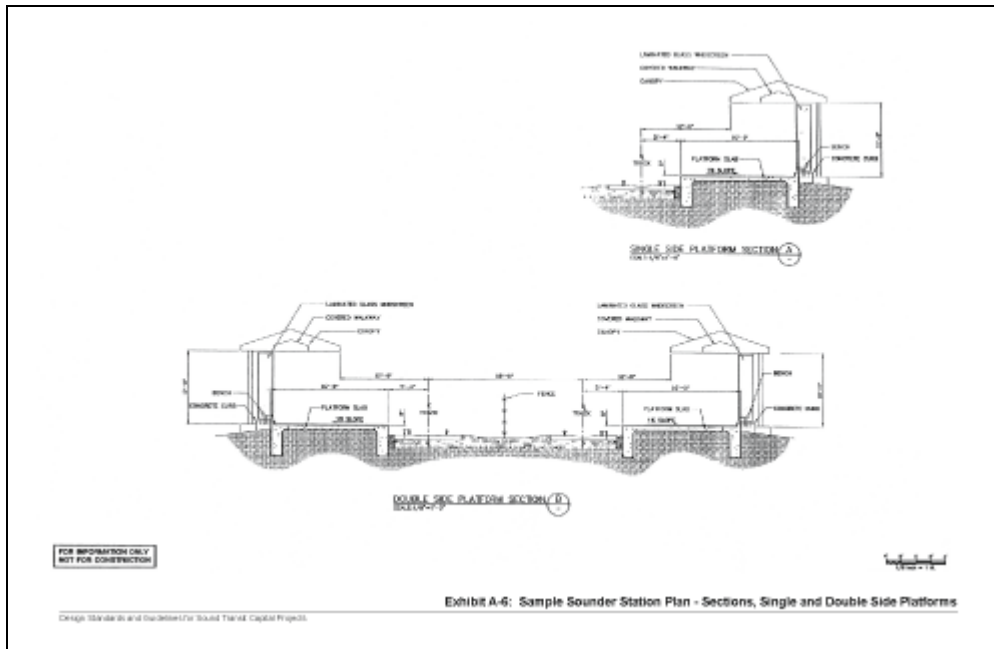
Sample Sounder Station Plan – Sections, Single and Double Side Platforms (738 KB)
